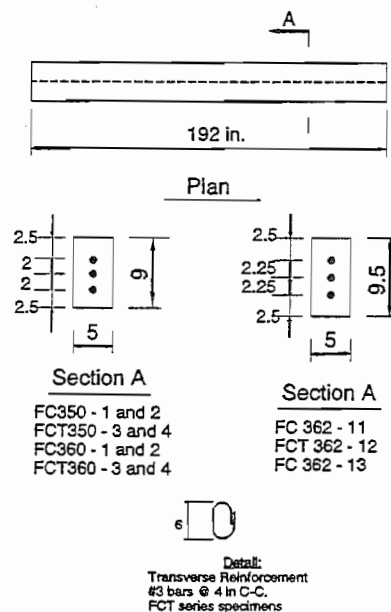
Details of Fully Bonded, Three Strand Specimens
